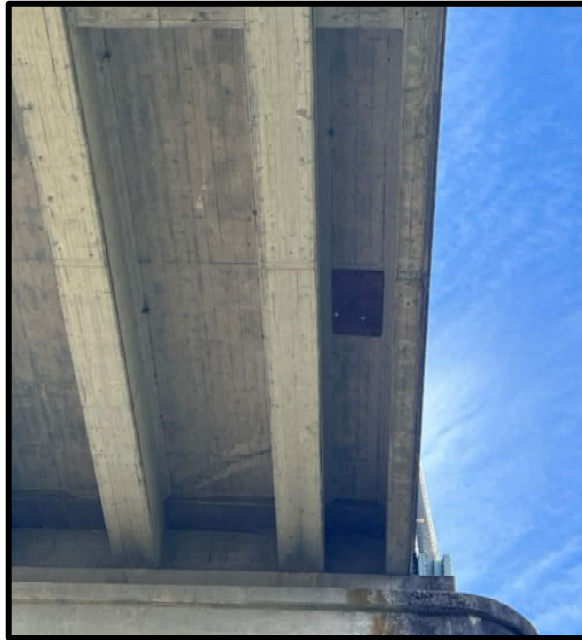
Span 7, Beam A & B – Patched Spall with Plywood, Beam B & C – Crack near Pier 4
